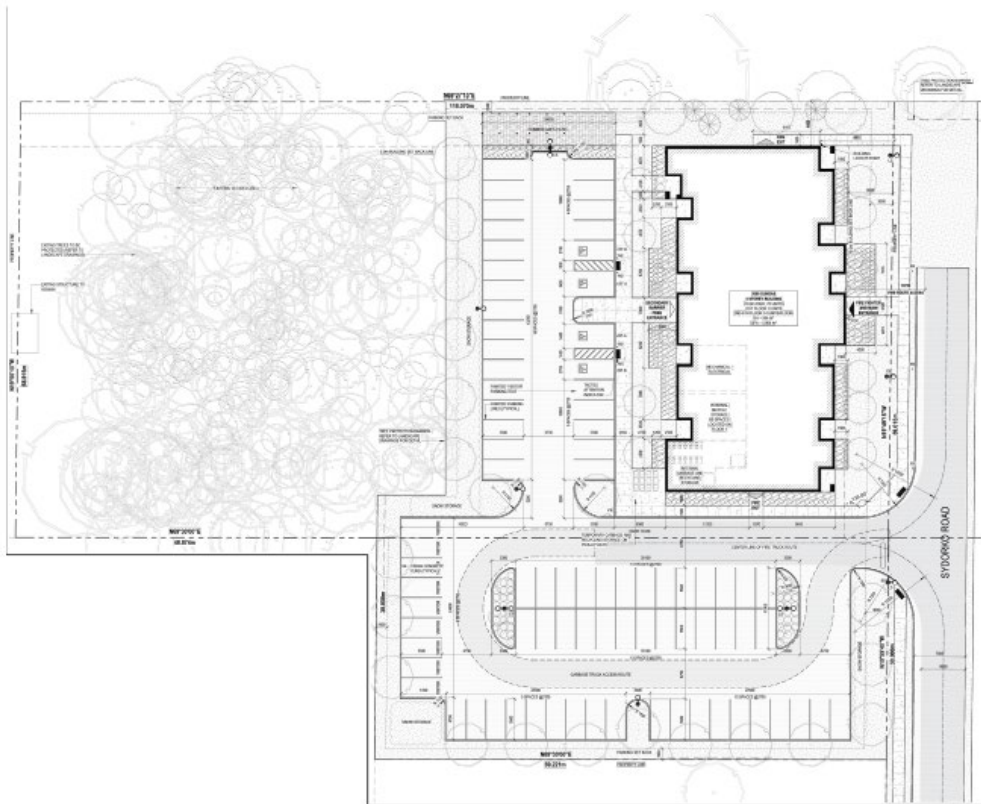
Conceptual Site Plan – close up of area to be developed (original concept)
